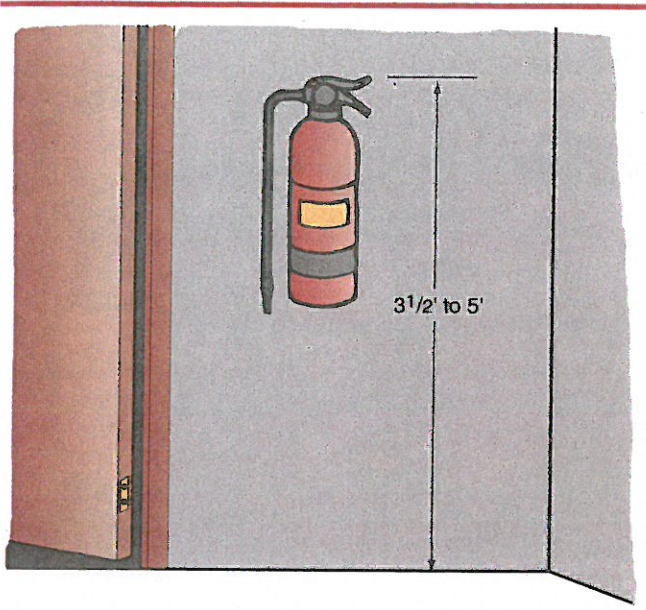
Fire extinguishers should be hung on the wall so the top of the extinguisher is not more than 3½ to 5 feet above the floor.
